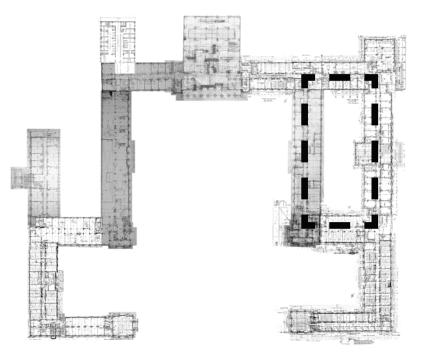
Completed circulation system in the case of present Building 6. The collage of drawings is indicative as the plans of the existing buildings are the original ones and do not reflect the spatial articulation of the time.
